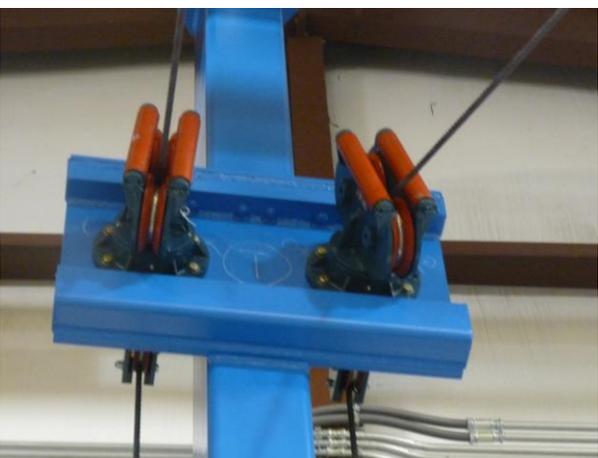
Sheaves and Fairleads at top of towers that manage steel cables suspending work platform.
